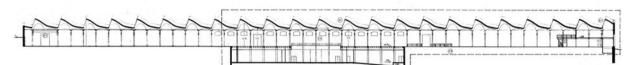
Section of the former production hall with the underground extension and the administration mezzanine (mNACTEC documentation centre).
